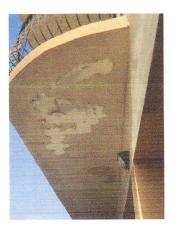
Figure D: Balcony Soffit paint spalling in units 208, 703, & 1301.
